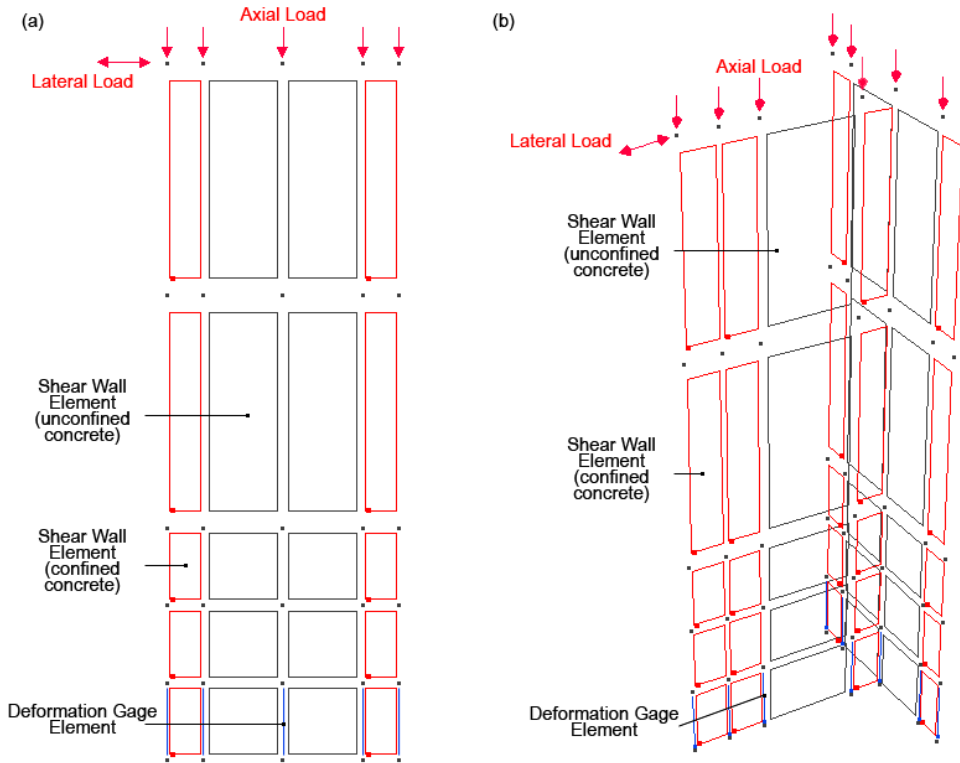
Meshes and loads for (a) RW2 wall specimen and (b) TW2 wall specimen.
